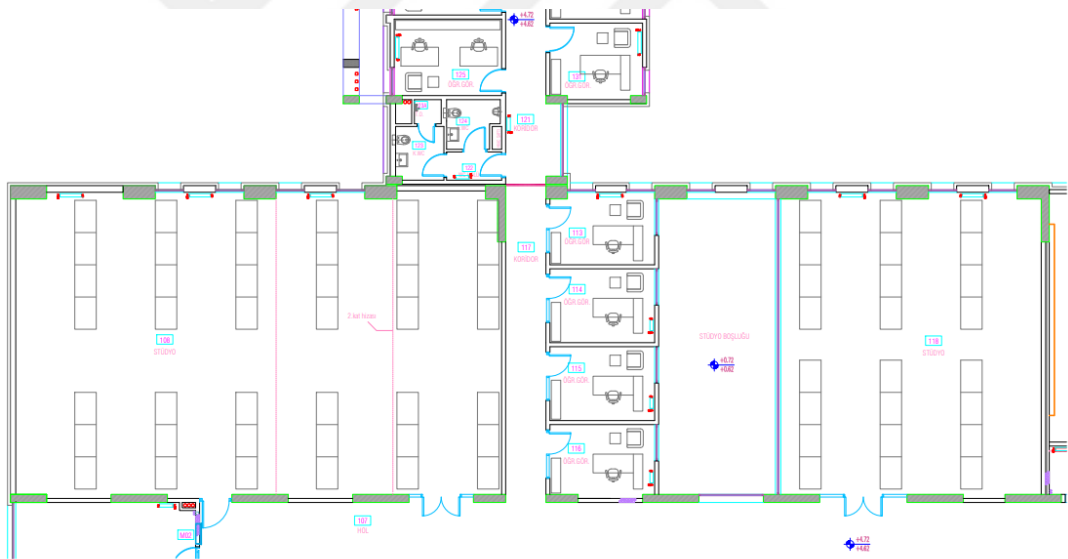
The plan of the studio classrooms on the first floor is positioned on the north facade.
